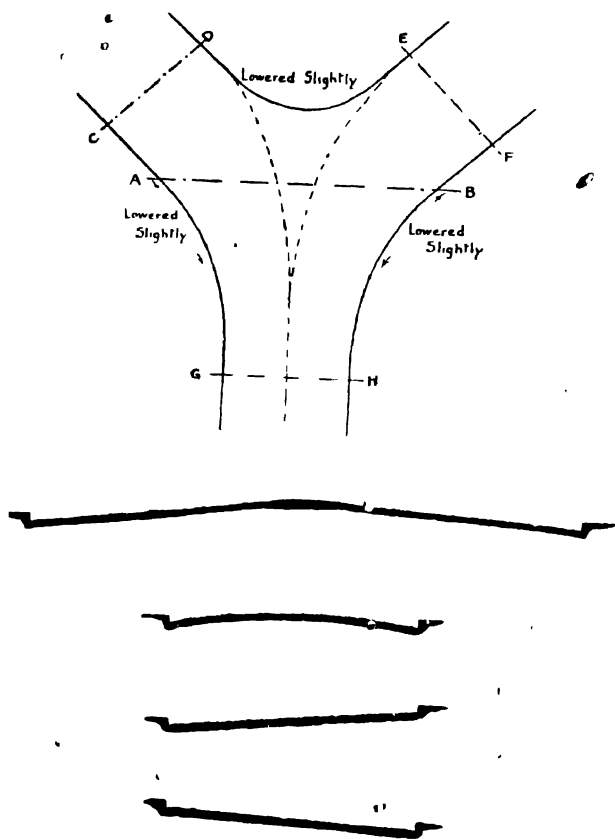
Junction of Roads—Superelevation of "Forked Road" ;
